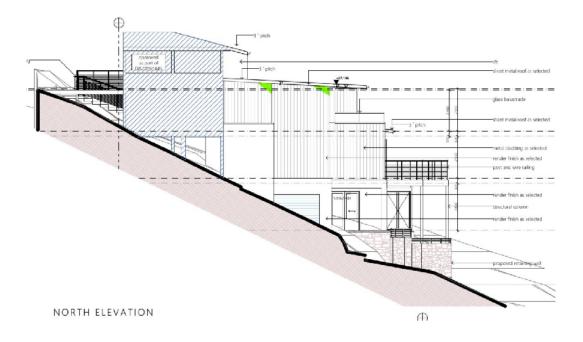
Proposed building envelope non-compliance on the northern elevation (highlighted in green).
